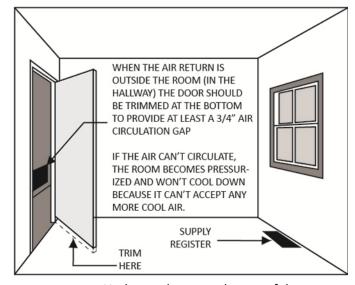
01-29 Undercut doors can be a useful strategy to achieve proper ventilation.
